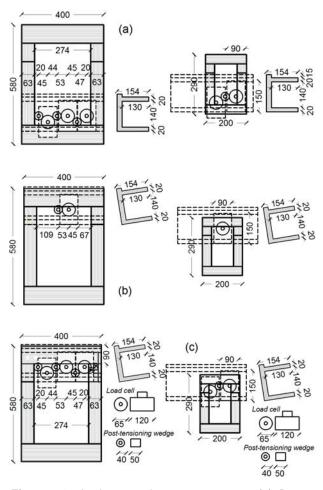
Anchorage plates test setup – (a) Bottom configuration (b) Top configuration (c) External configuration
